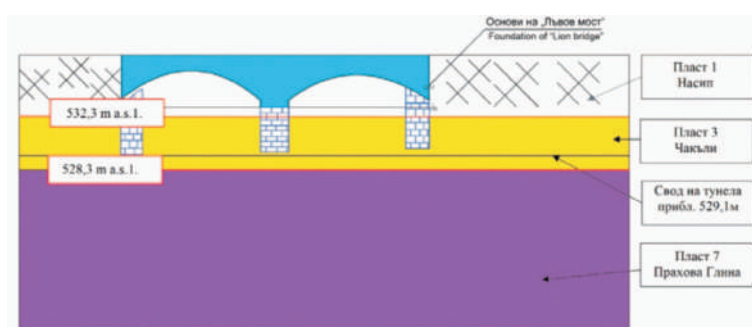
Geological section of Lion Bridge and earth foundation [6]
